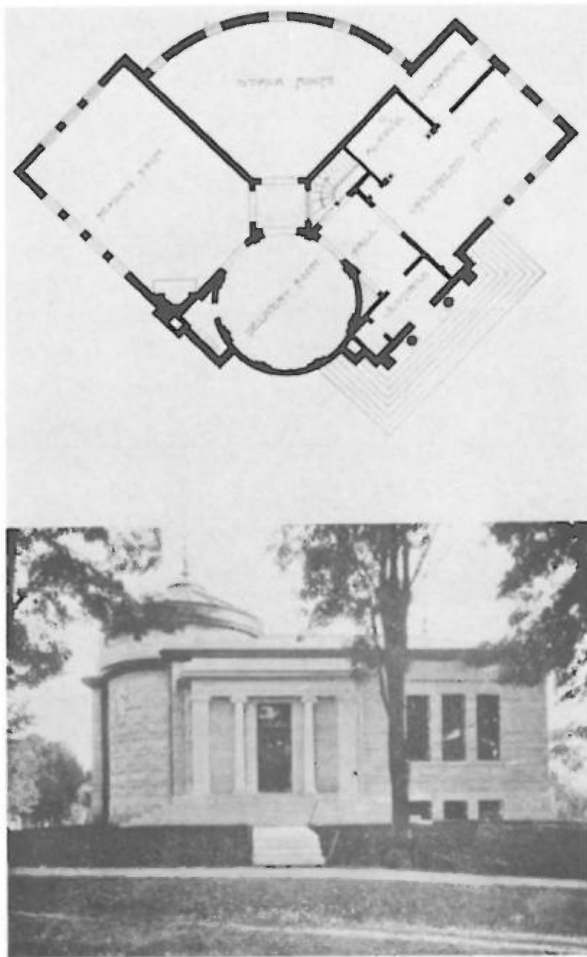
Floor Plan and Principal Elevation of Cutler Library, Farmington, *The American Architect*, March, 1904 (MHPC).
